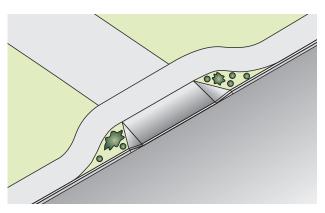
Curb tight sidewalk wraps to the back of driveway
